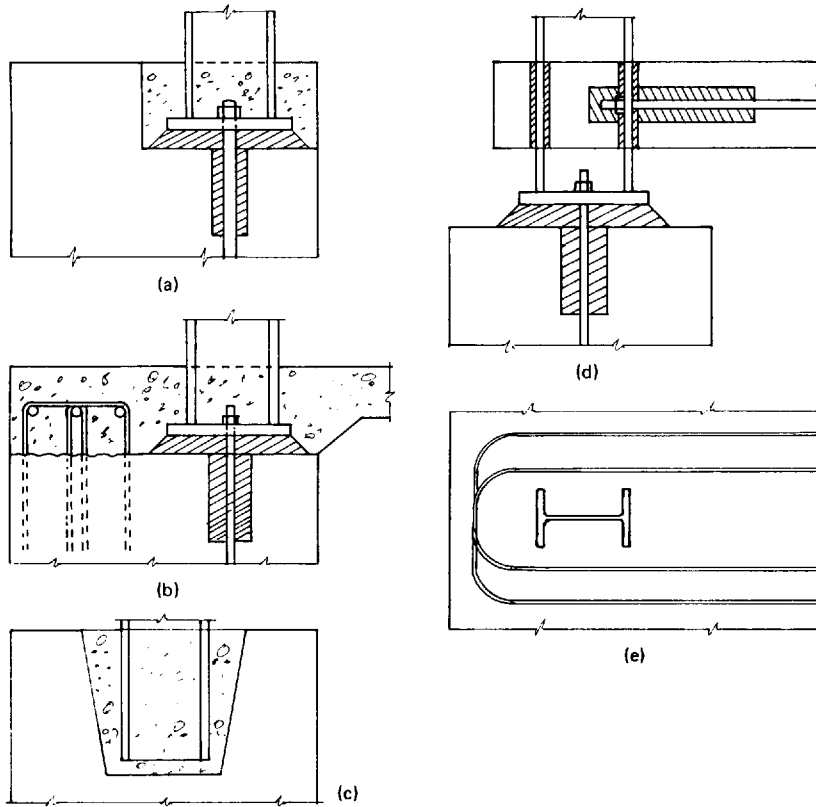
Arrangements for resisting column shear. (a)–(c) Shear transmitted into column base; (d) shear carried by tie between columns; (e) slab reinforcement to resist shear
